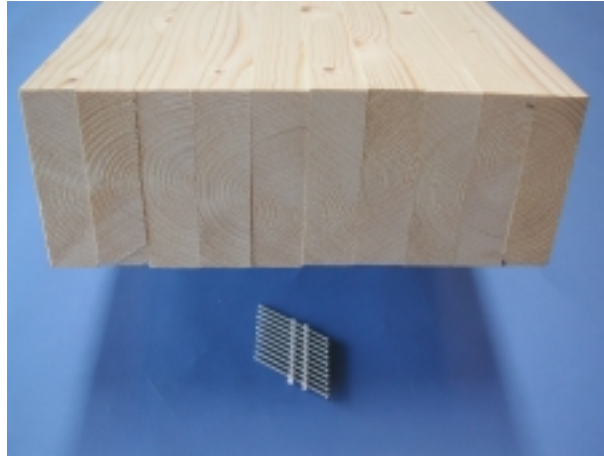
Nailed element specimen – i.e. a specimen not containing any adhesive components.
